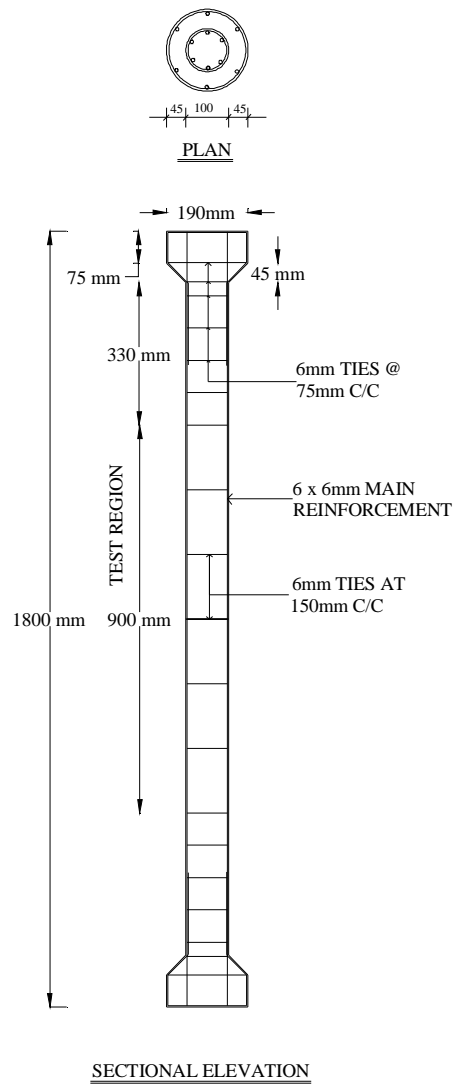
Sketch showing plan and sectional elevation of slender column (typical)
